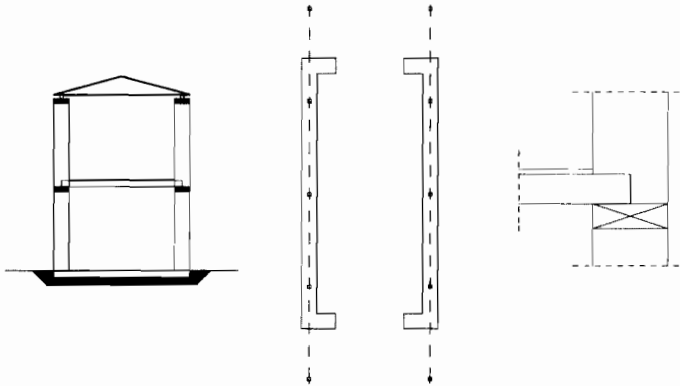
Loam and timber construction, 2 floors - *LT2*, section, floor plan and detail.
